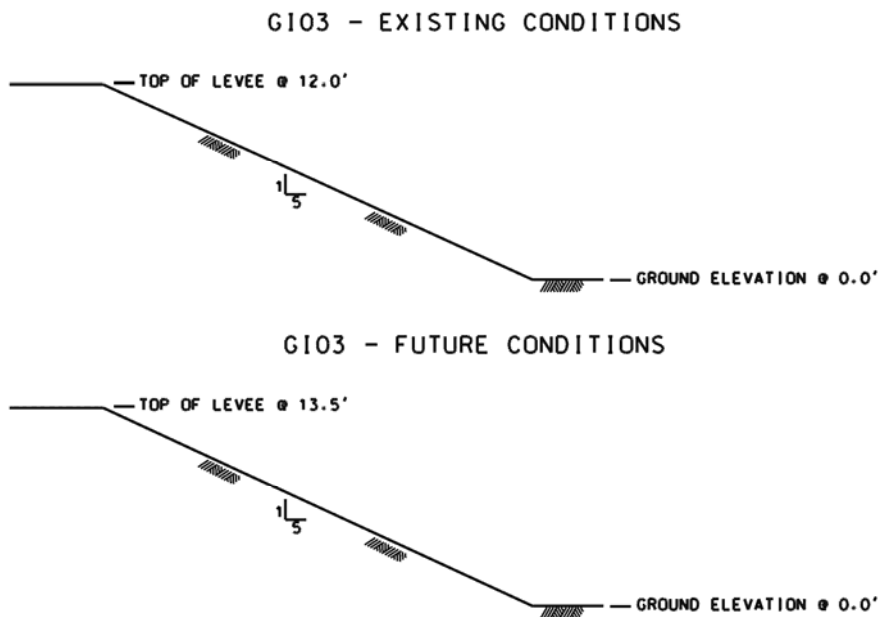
Typical Levee Design Cross-Section – GI03 section for existing (upper panel) and future conditions (lower panel).
